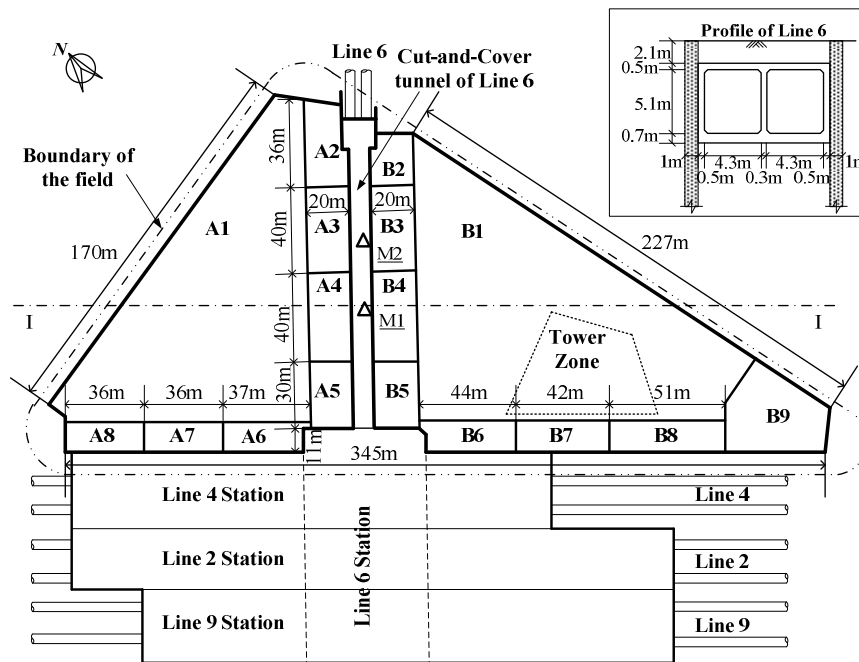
The scheme of excavation and adjacent Metro tunnels.
